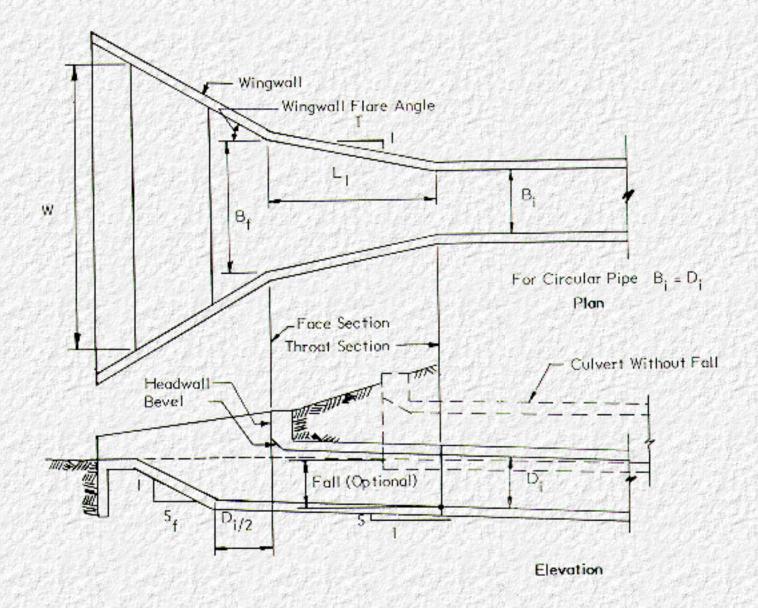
Side Tapered Box Section or Pipe Inlet Geometry
